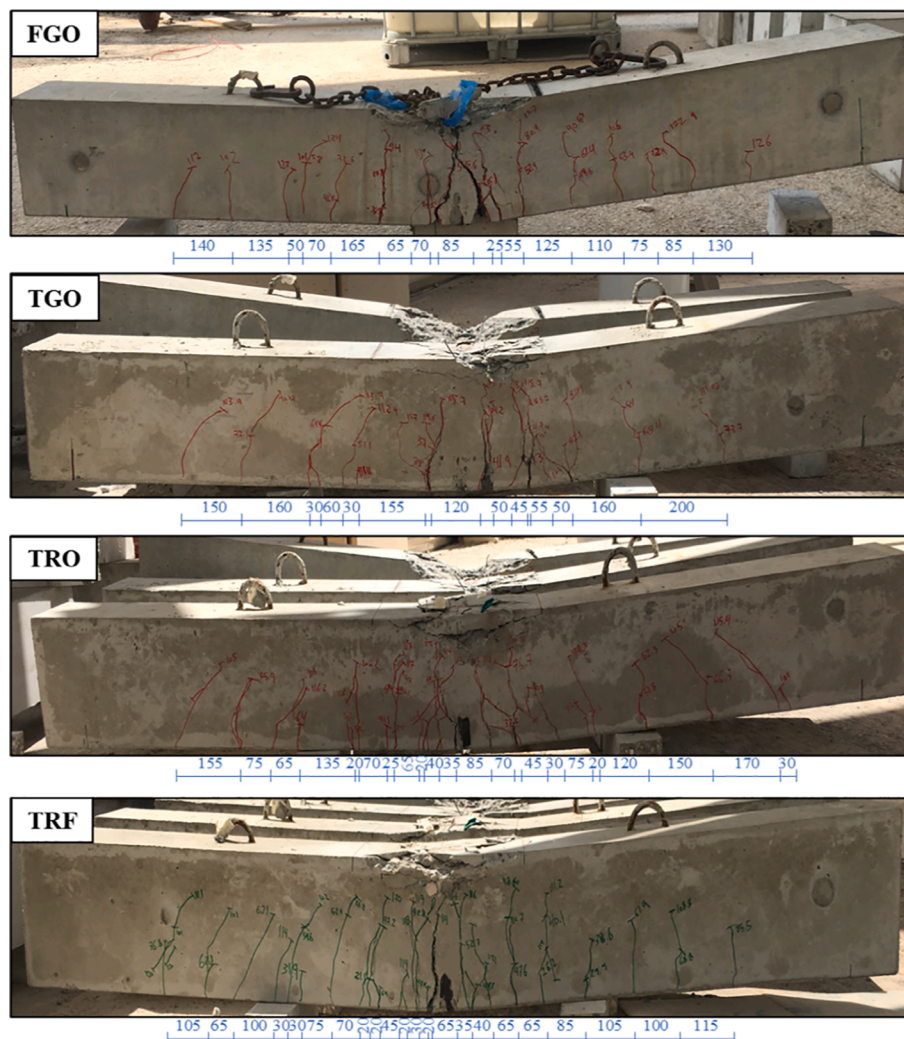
Cracking patterns and failure modes of the beams (crack spacing is in mm).
